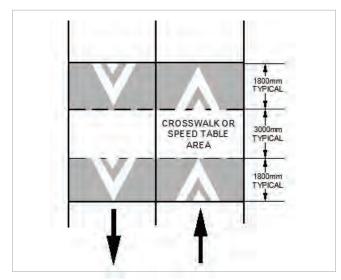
Raised Crosswalk Pavement Markings
